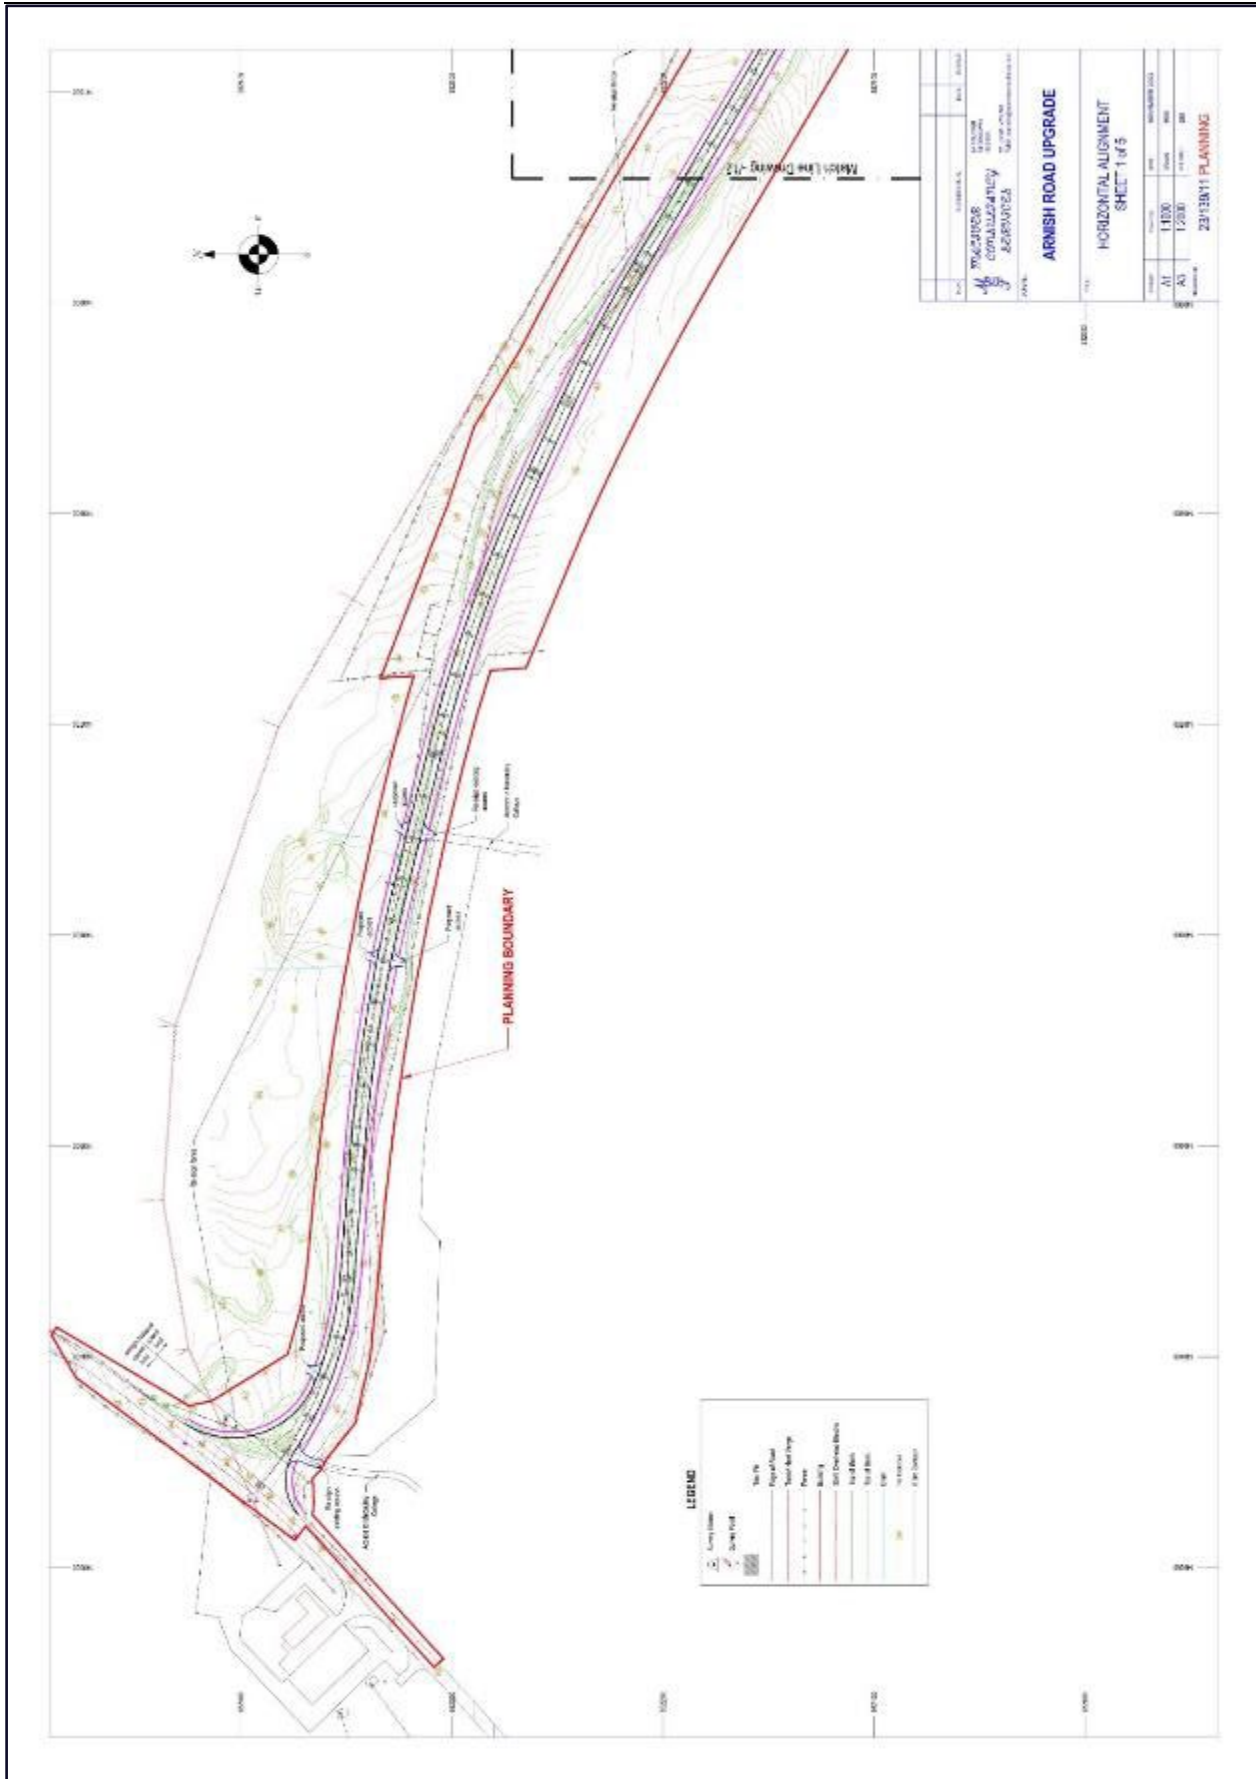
Engineers drawing #11 – from the main A859 trunk road turn off
